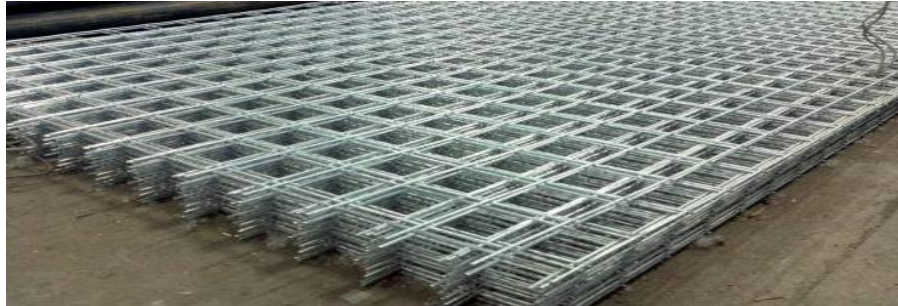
11: Galvanized Rebar (<https://theconstructor.org/practical-guide/steel-reinforcement-types-grades/24730/>).
